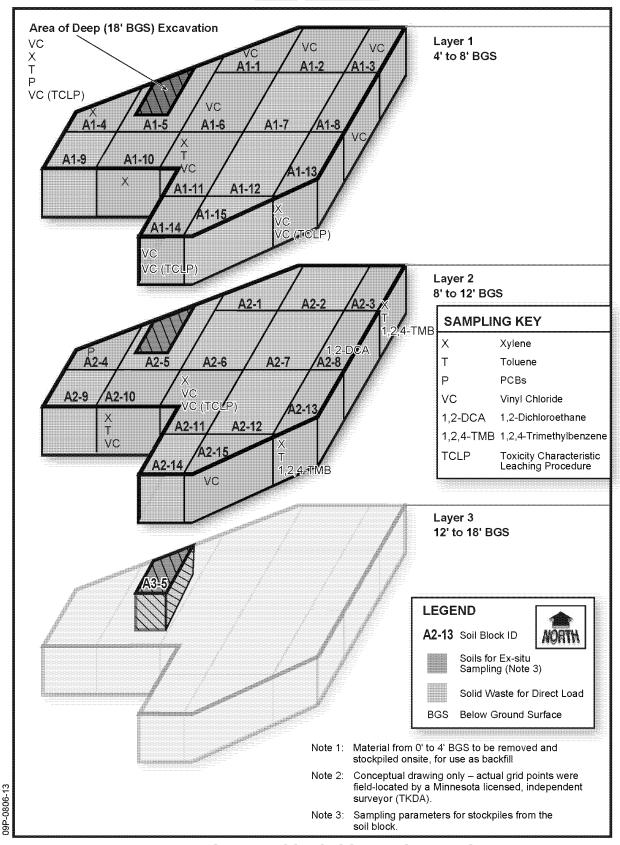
SOIL STOCKPILE SAMPLING AREA A, WOODBURY SITE WOODBURY, MN
